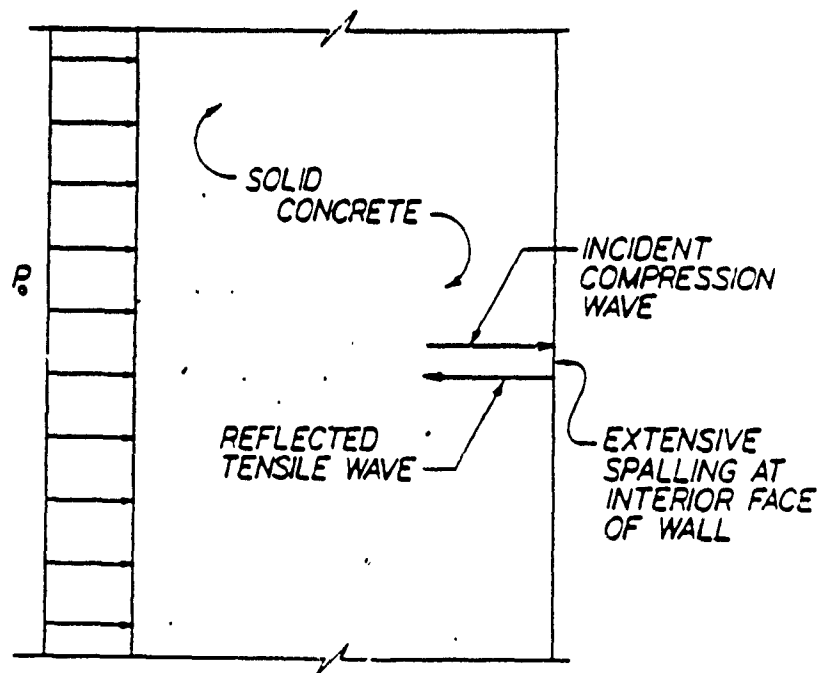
Blast Wave Propagation in Monolithic Wall of a Typical Protective Shelter.
